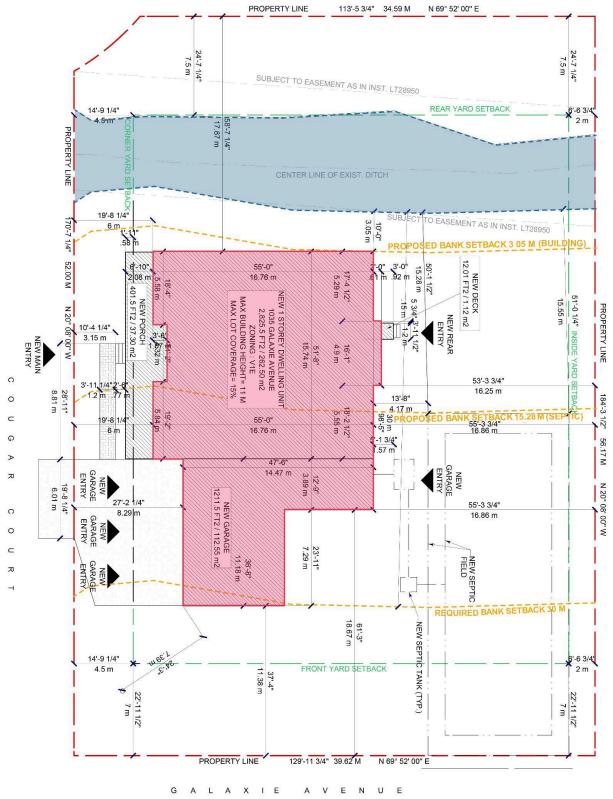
Site Plan by Dustin Design & Drafting showing the property boundary, the proposed building footprint, and the drainage ditch (top of bank).
